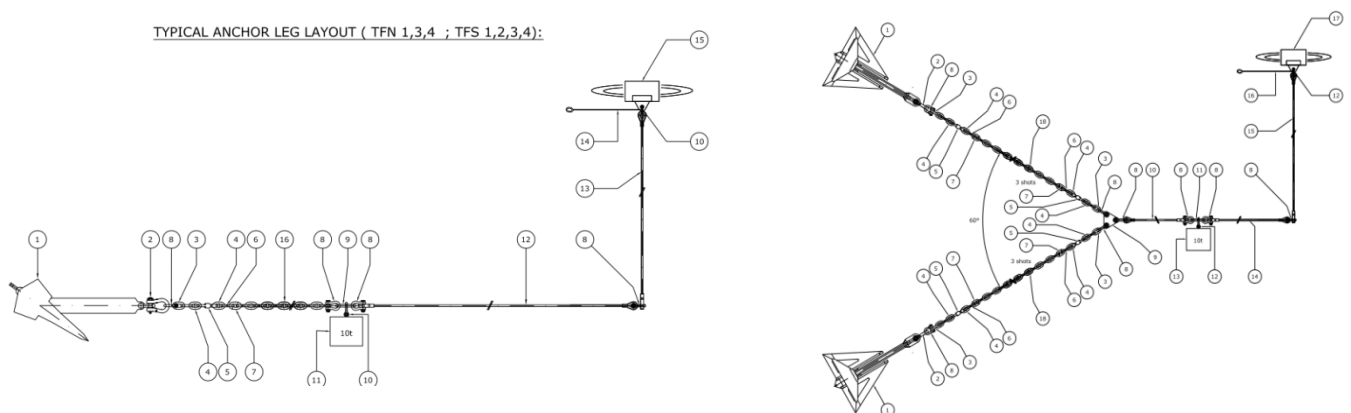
Anchor Leg Mooring Layout North TF 1,3,4 and South TF 1,2,3,4; Right Side: Anchor Leg Mooring Layout North TF 2 (Delta Anchoring). Courtesy of STFA Construction Co.
